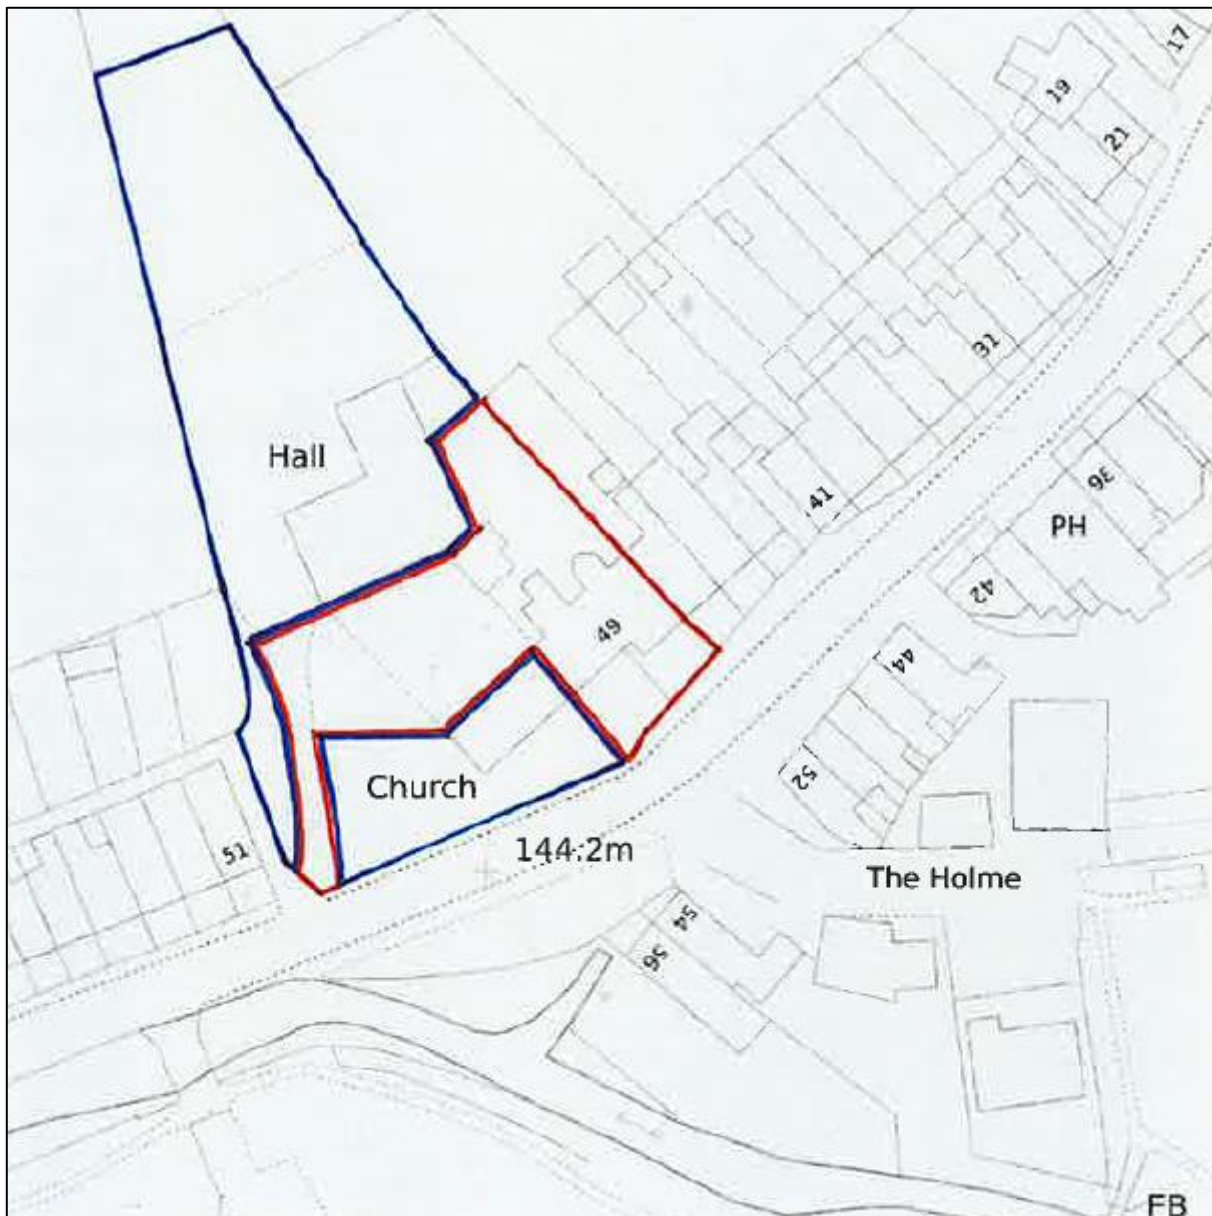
Location Pan showing the application site (red) and no.49 Whalley Road.
